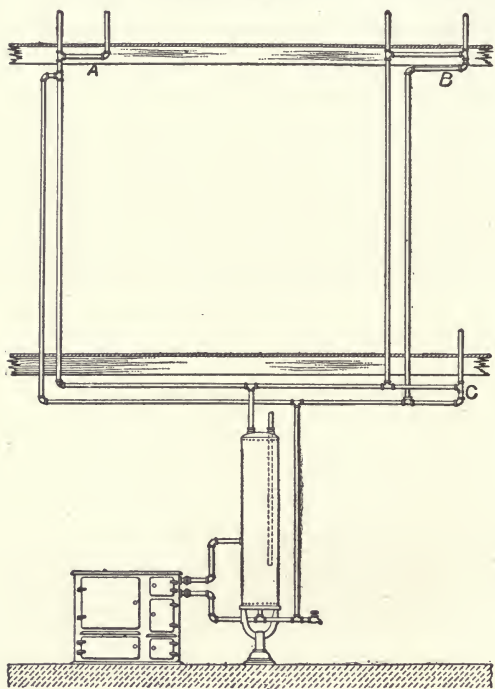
A Circulating System with Branches Planned to Avoid Air Locking or Sagging Under Floors.
